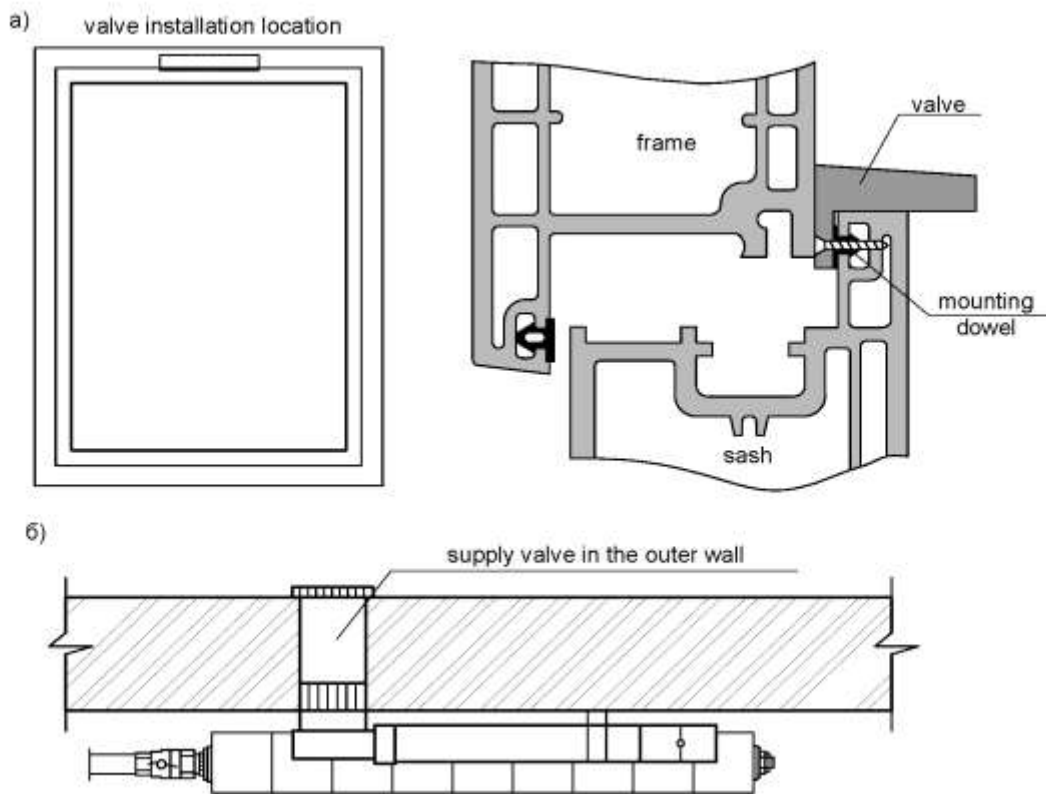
Conventional placement of ventilation valves in windows (a) and walls (b) of a residential building
